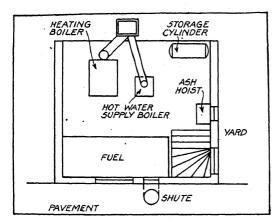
Plan of Boiler House in Medium-SIZED HOUSE
